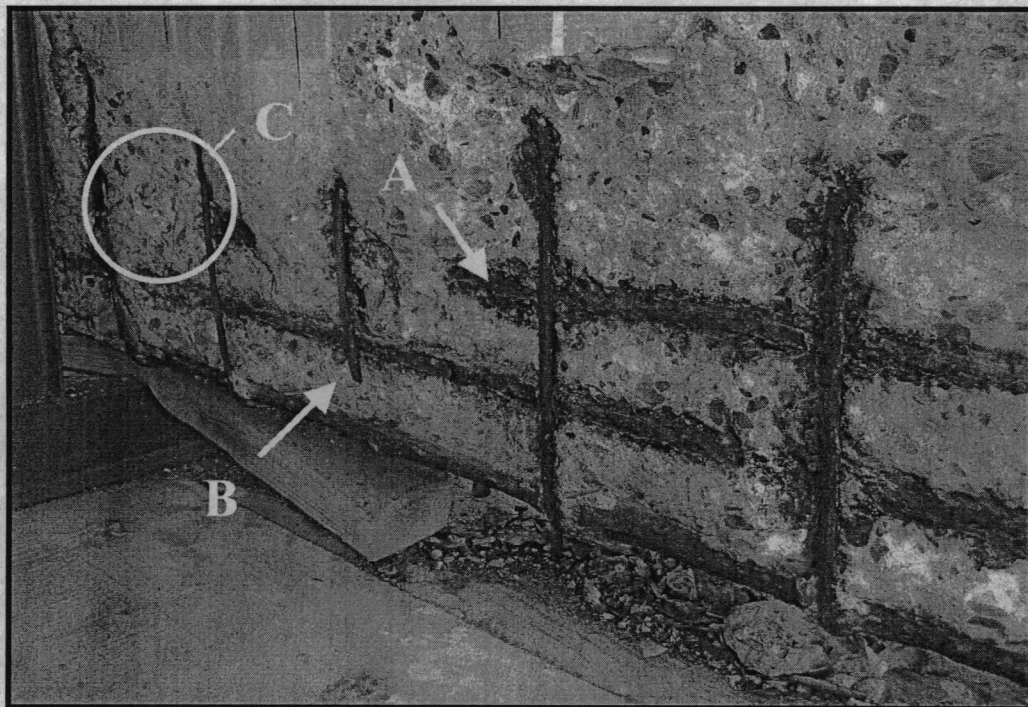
Corrosion distress on a coastal bridge girder constructed in 1954.
